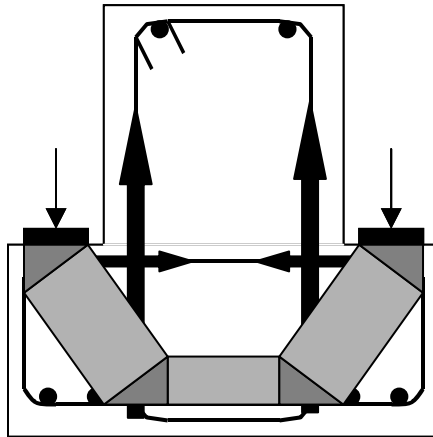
Inverted T Girder, Widely Accepted Strut-and-Tie Model
